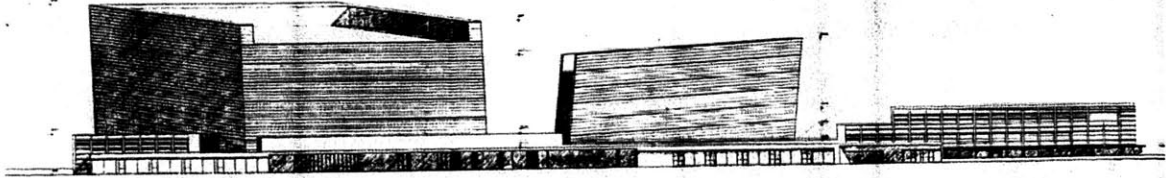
El Kursaal, Elevation from Zurriola Avenue
